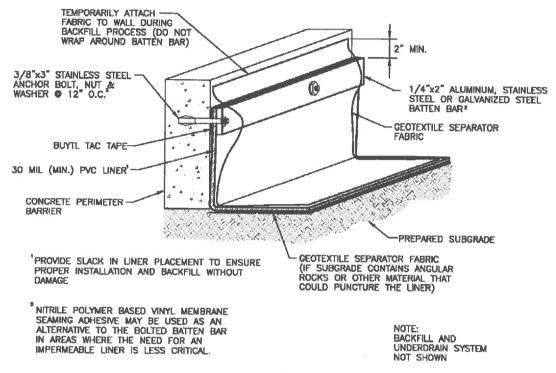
Geomembrane Liner/Concrete Connection Detail
